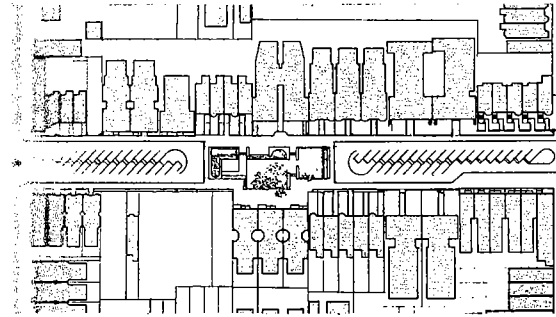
Site Plan of Saint Marks Avenue, New York City. Plan shows modifications to vehicular circulation and parking and provision of play and sitting areas.
